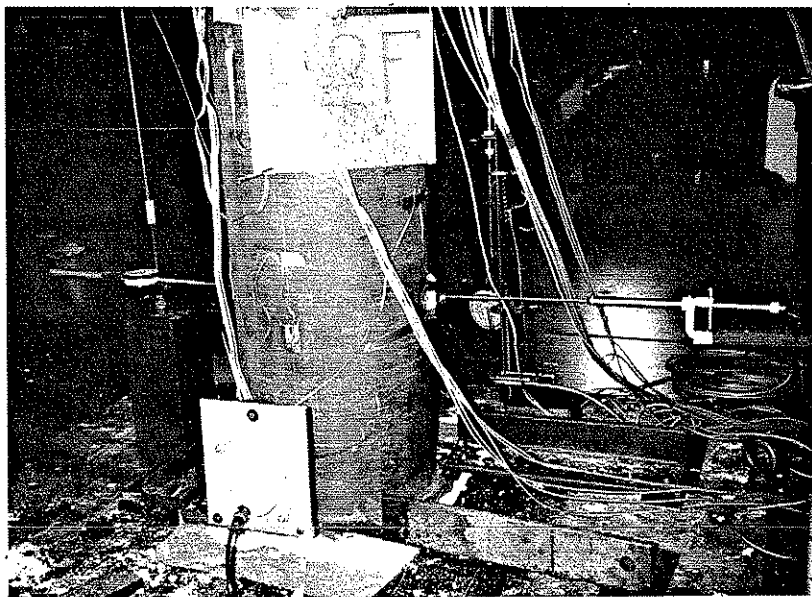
Setup of Bottom Fixed End and Rotation Gage for Specimen P2F.
